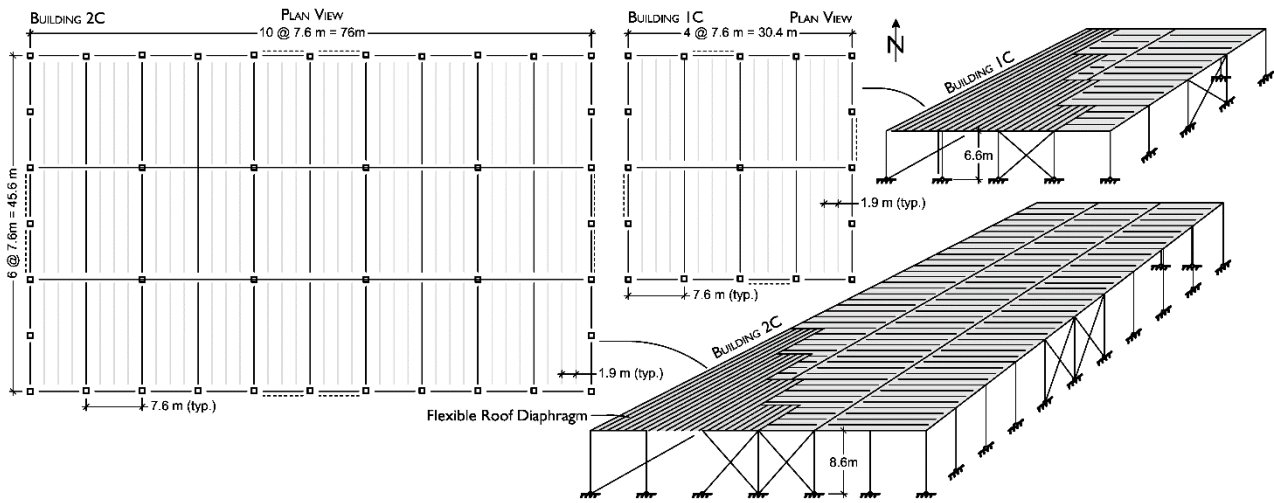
Prototype single-storey building with flexible roof diaphragm
